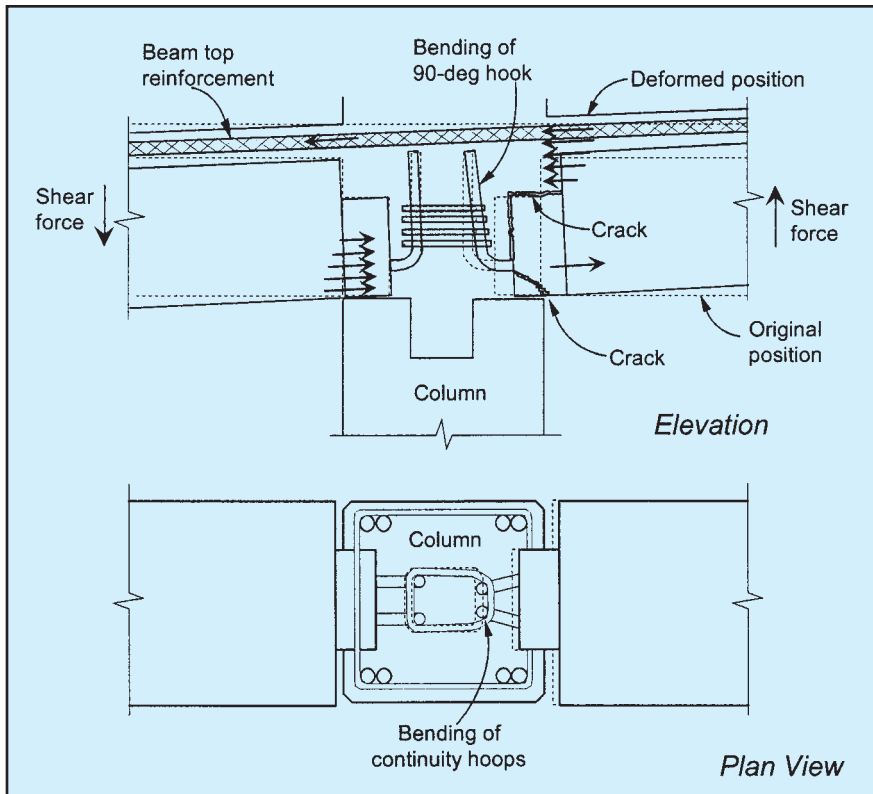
Proposed plastic mechanism at failure of Specimen J1.
